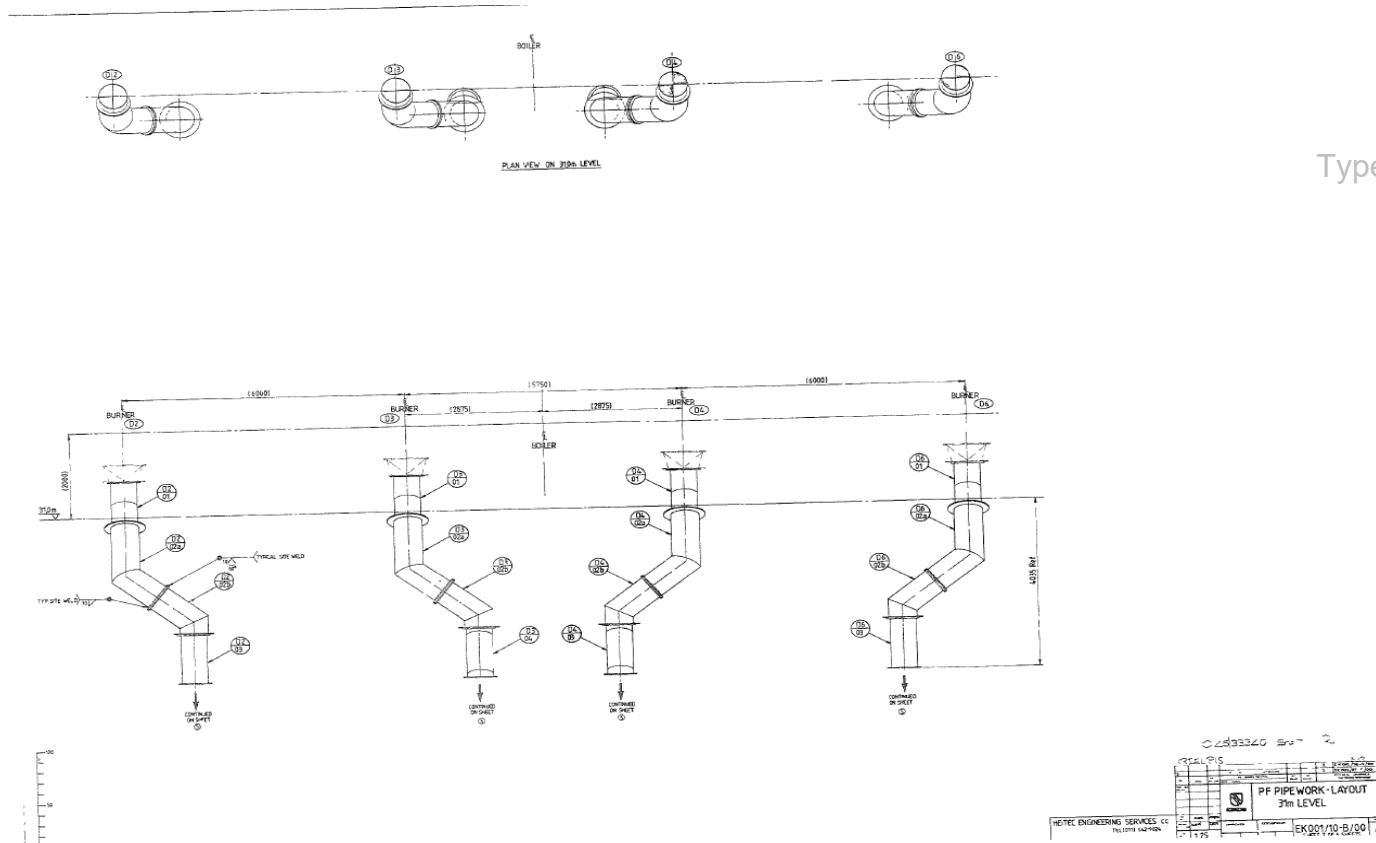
Unit 4-6 Mill C PF pipes arrangements and elevation around the boiler
